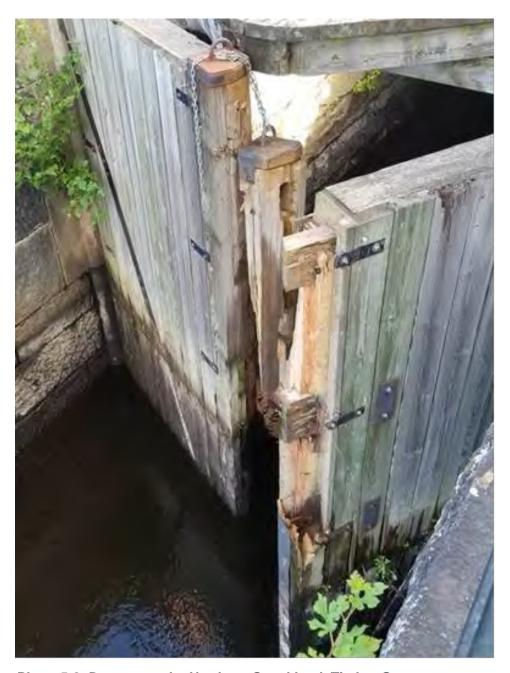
Damage to the Northern Canal Lock Timber Gate.
